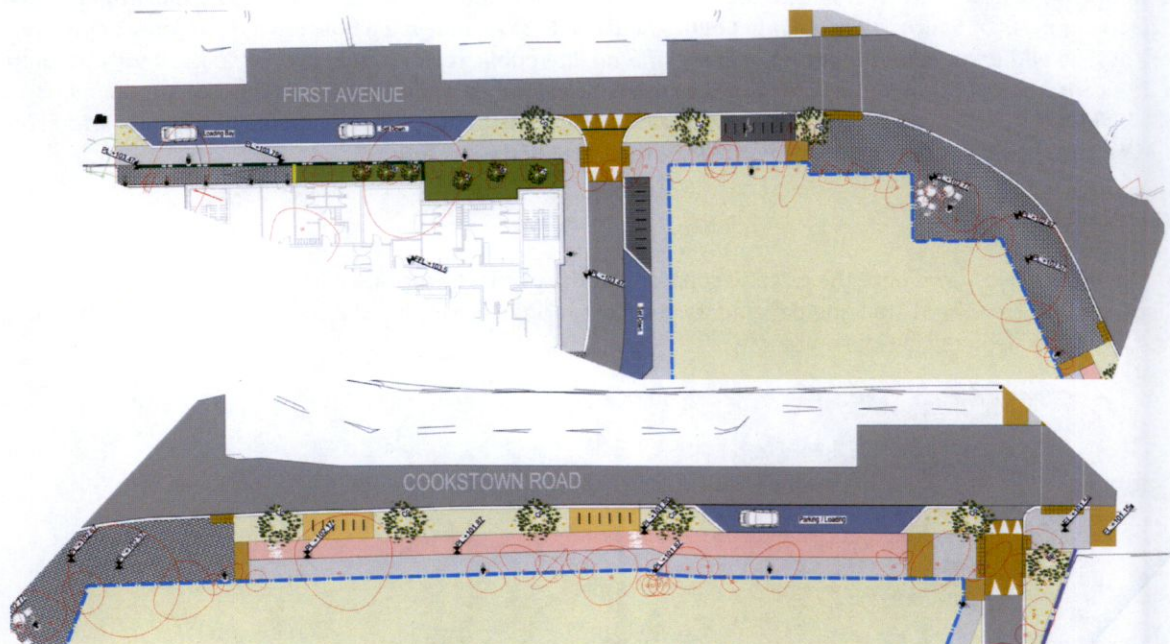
Proposed Public Realm Improvements to First Avenue and Cookstown Road
